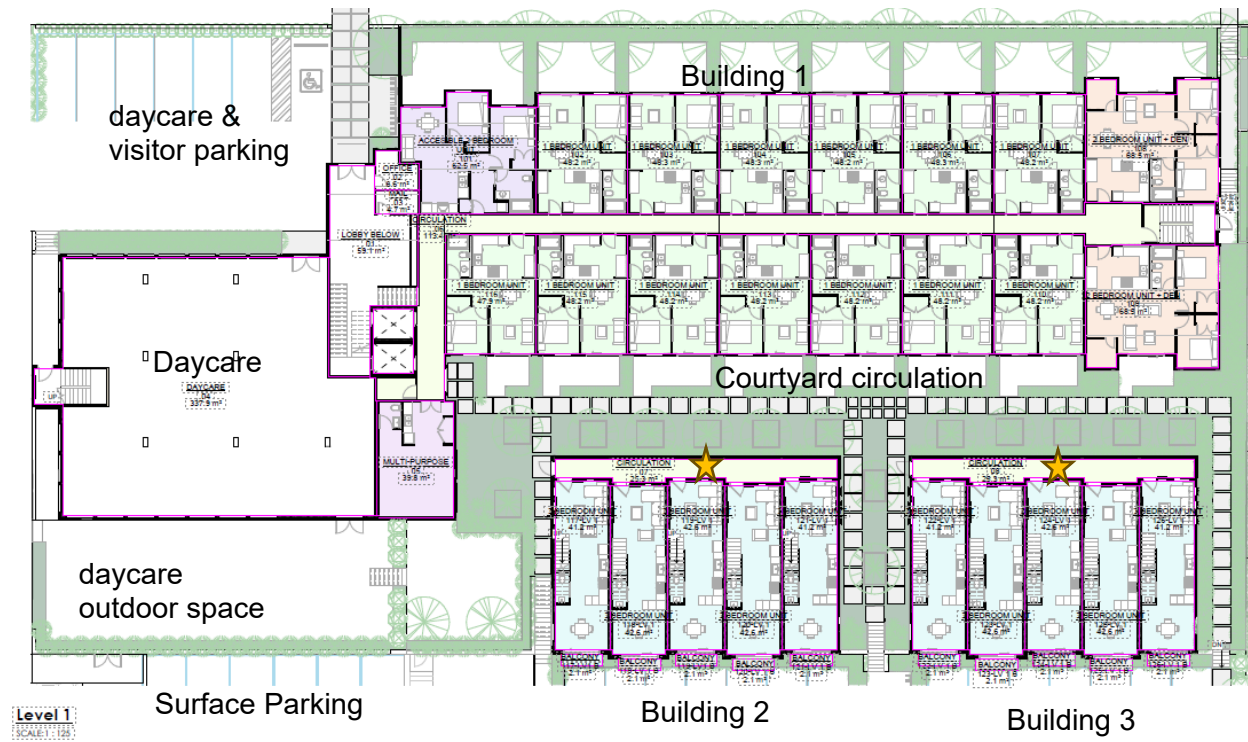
Grade level plan, excluding surface parking south of the buildings.
